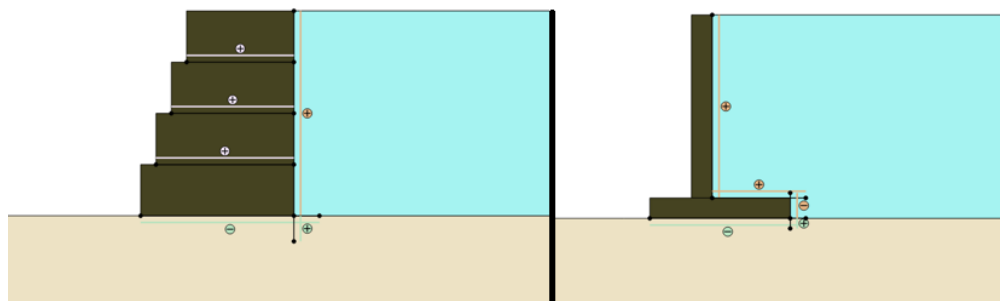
Gabion wall (left) and Cantilever wall (right)
